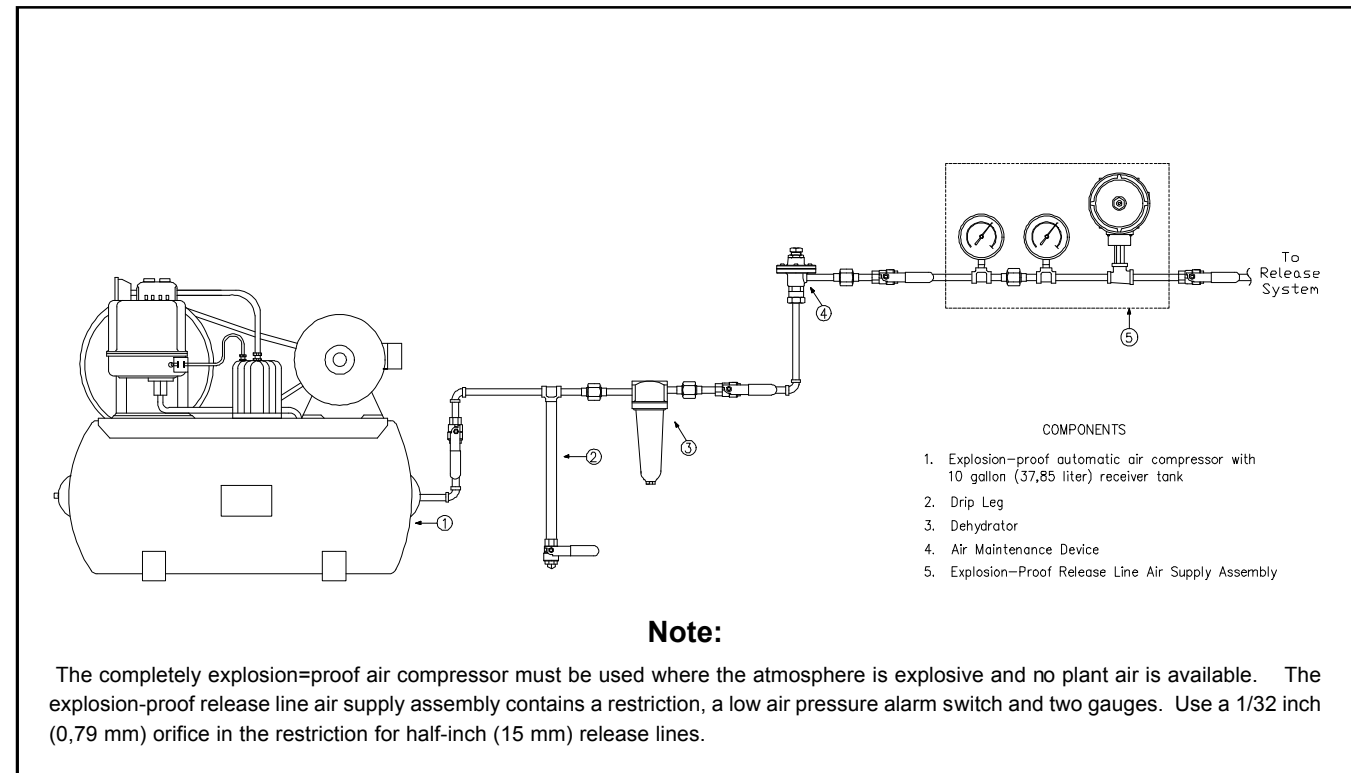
Air Supply Controller Utilizing an Explosion-Proof Compressor Unit with Pressure Switch
